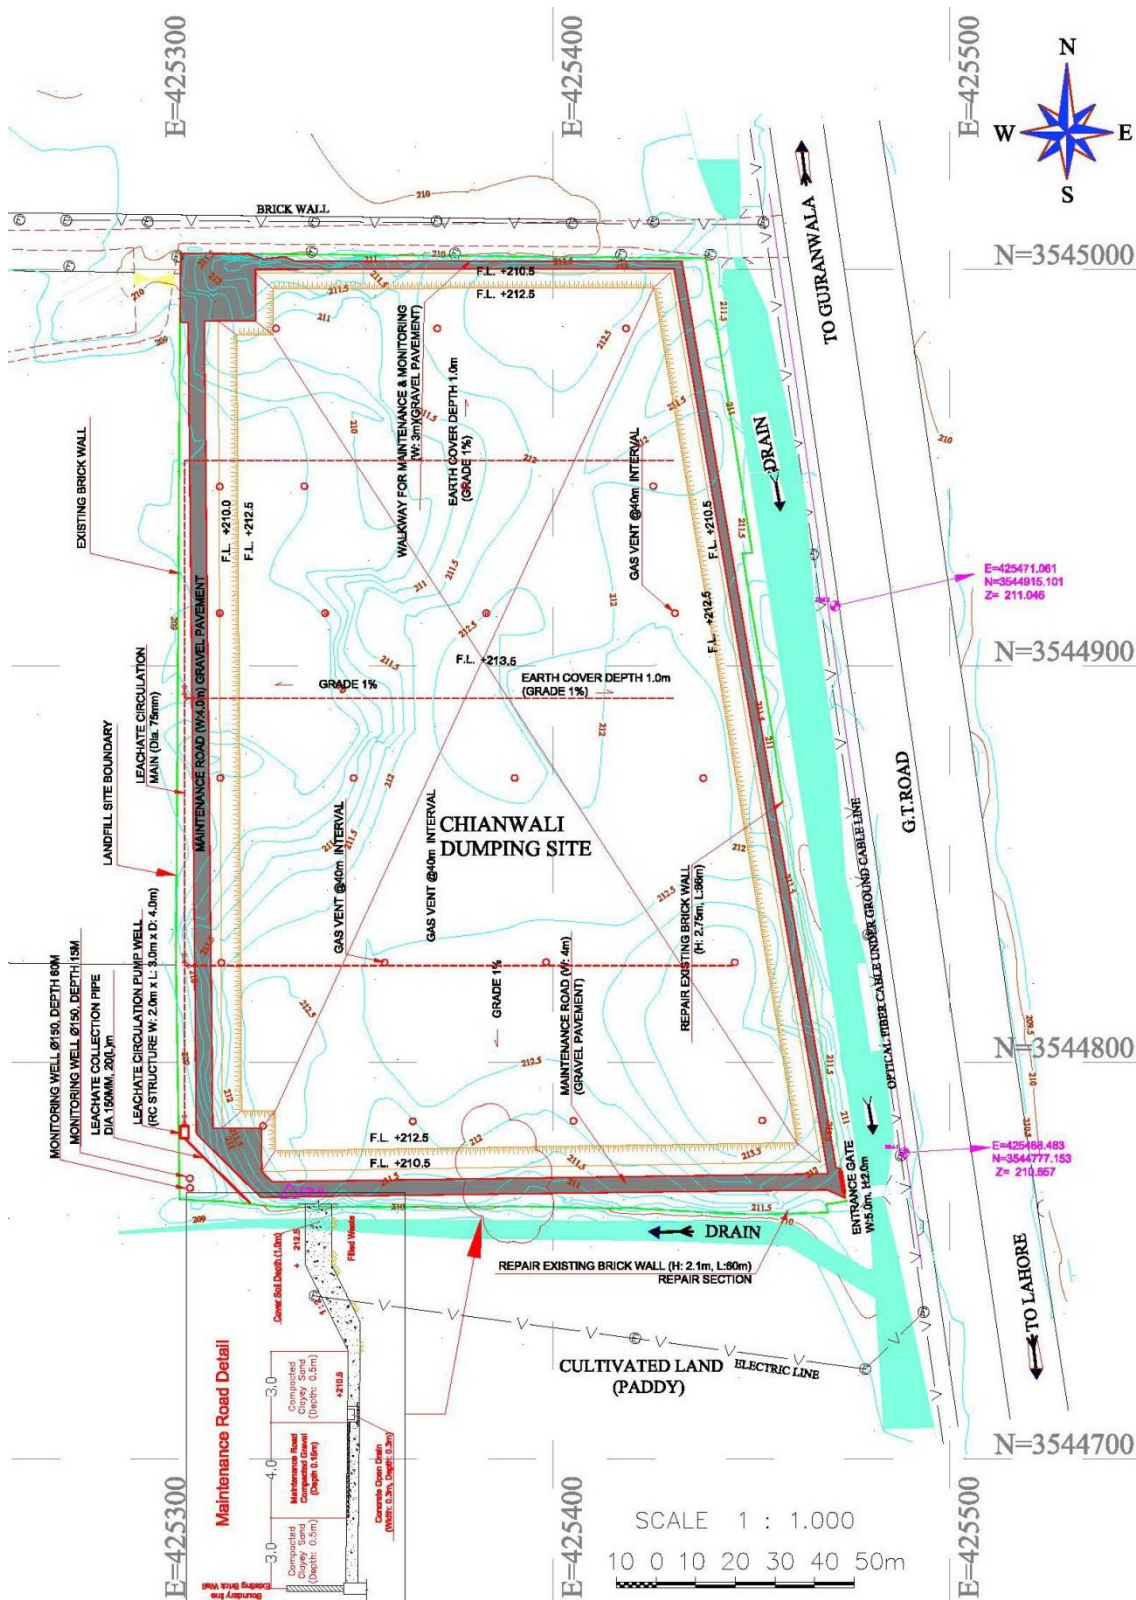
Layout Plan of Safe Closure Work at Chianwali Former Disposal Site
